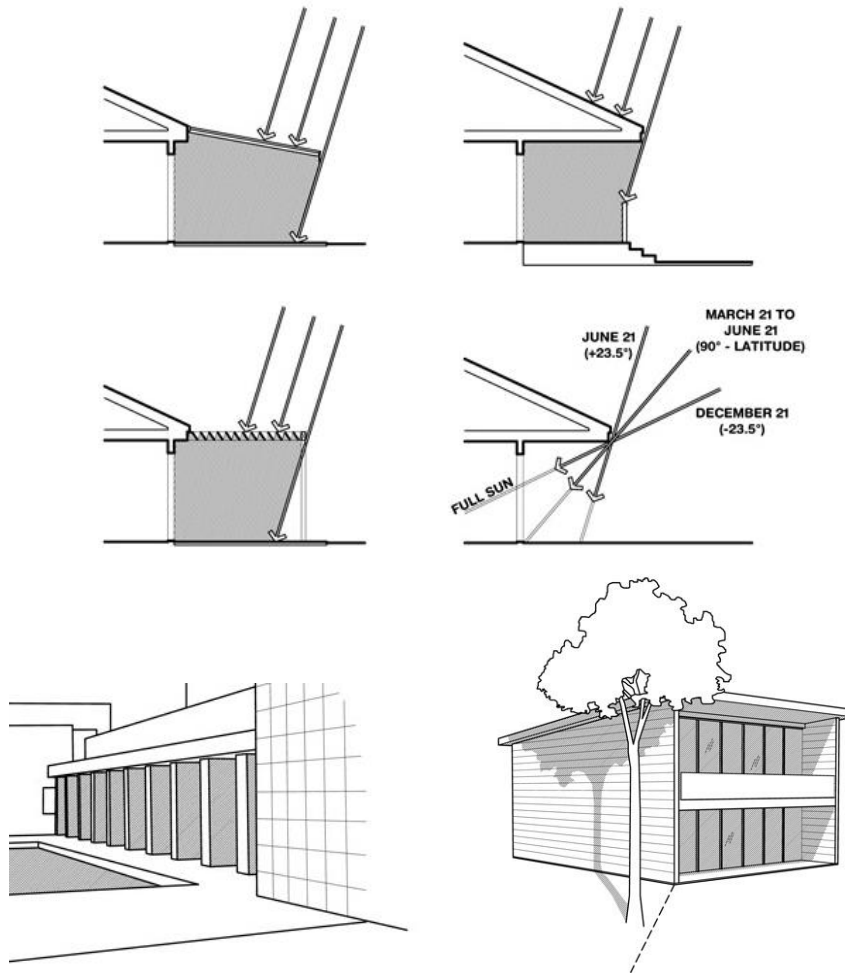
Solar shades are recommended in east, West and South facades of all buildings
